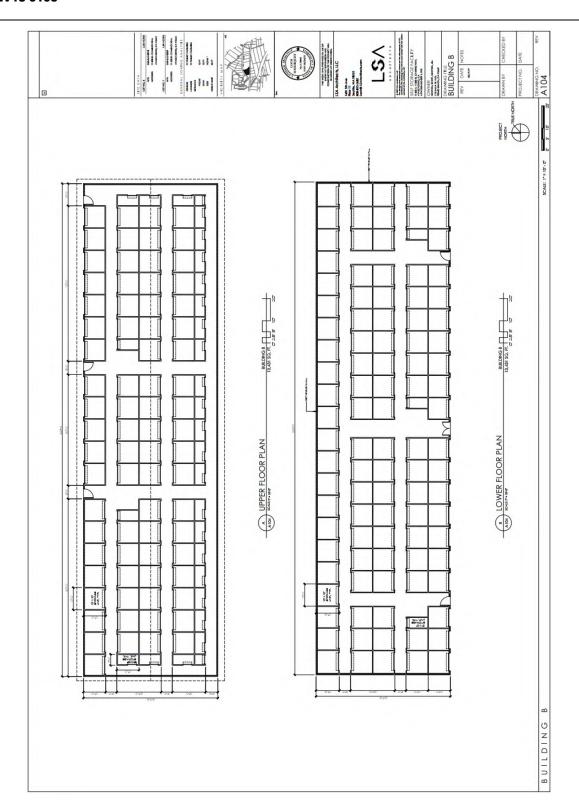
EXHIBIT D: Elevations and Floor Plans DEV18-0103
